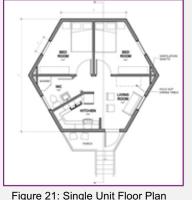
Single Unit Floor Plan (Source: dezeen.com) Figure 20: Interior spaces with minimal furnishing and finishes
